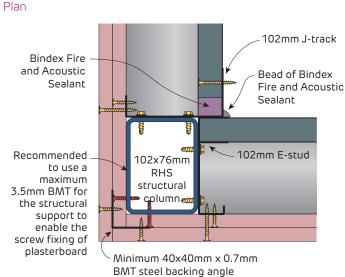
Shaft Wall Bulkhead External Corner using RHS Column with 102mm CH-Studs SHW2 Plan
